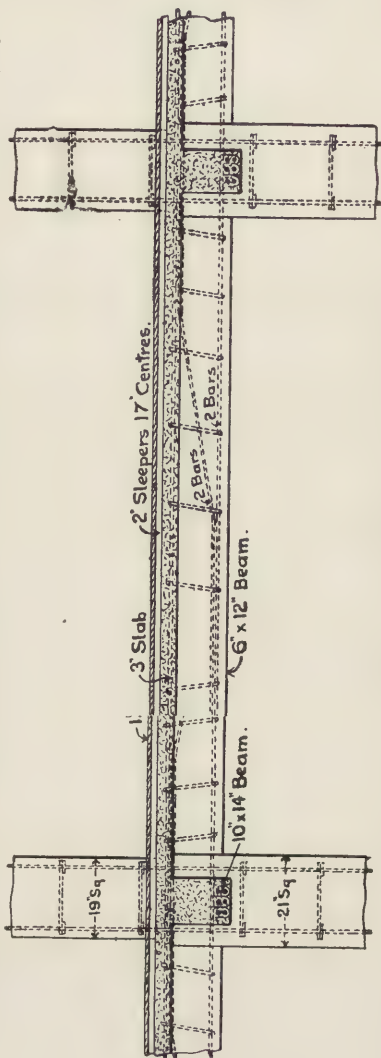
Details of Columns, Beams, and Floor Slab.
